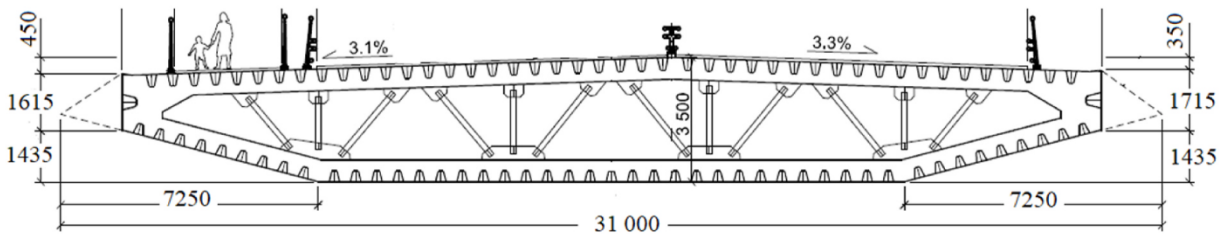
Technical drawing of the bridge girder. Units are in mm.
